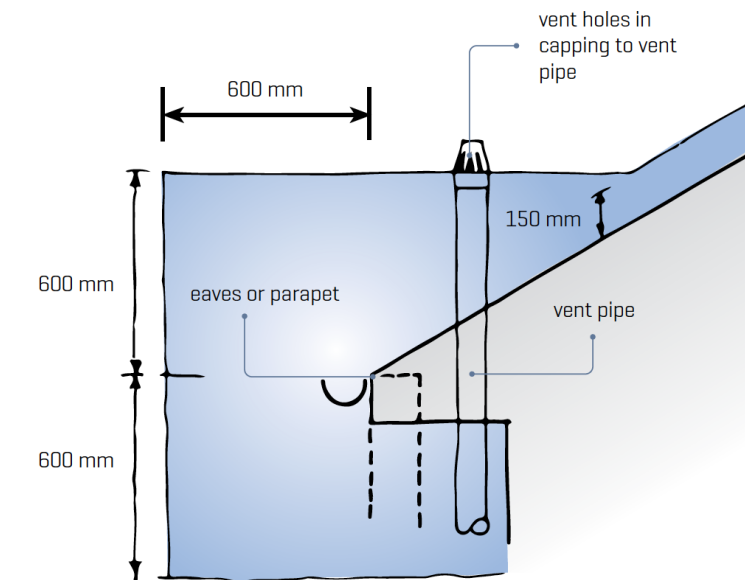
Termination point of vent 600 mm above an eave or parapet and 150 mm above a roof.
